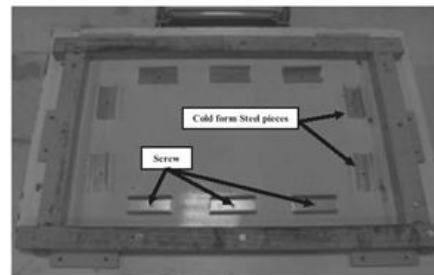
Frame for modified Kraai cracking slab test (double restrained slab early age cracking test).
